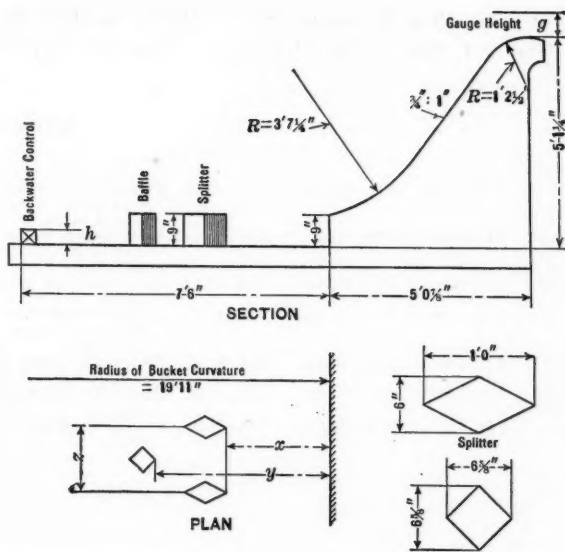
DETAILS OF MODEL USING PRISMS, PIT No. 3 DAM.
